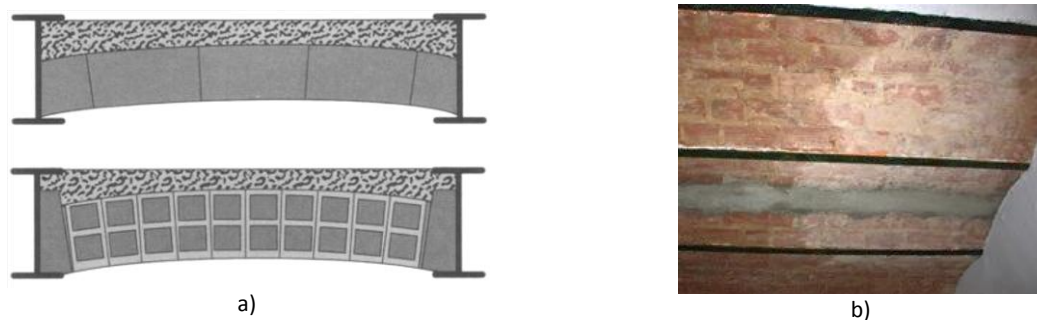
Steel frame flooring. a) Steel I profiles; b) Brick masonry disposed in vaults (Appleton J. , 2005).
